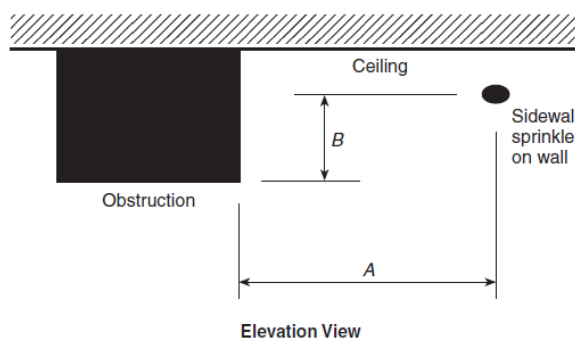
Positioning of Sprinkler to Avoid Obstruction Along Wall (Standard Sidewall Spray Sprinklers).
